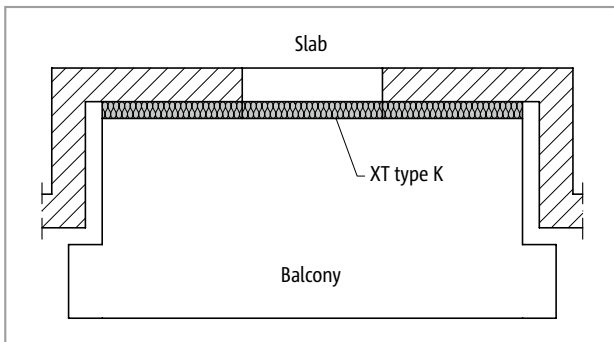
Schöck Isokorb® XT type K: Balcony with facade recess
